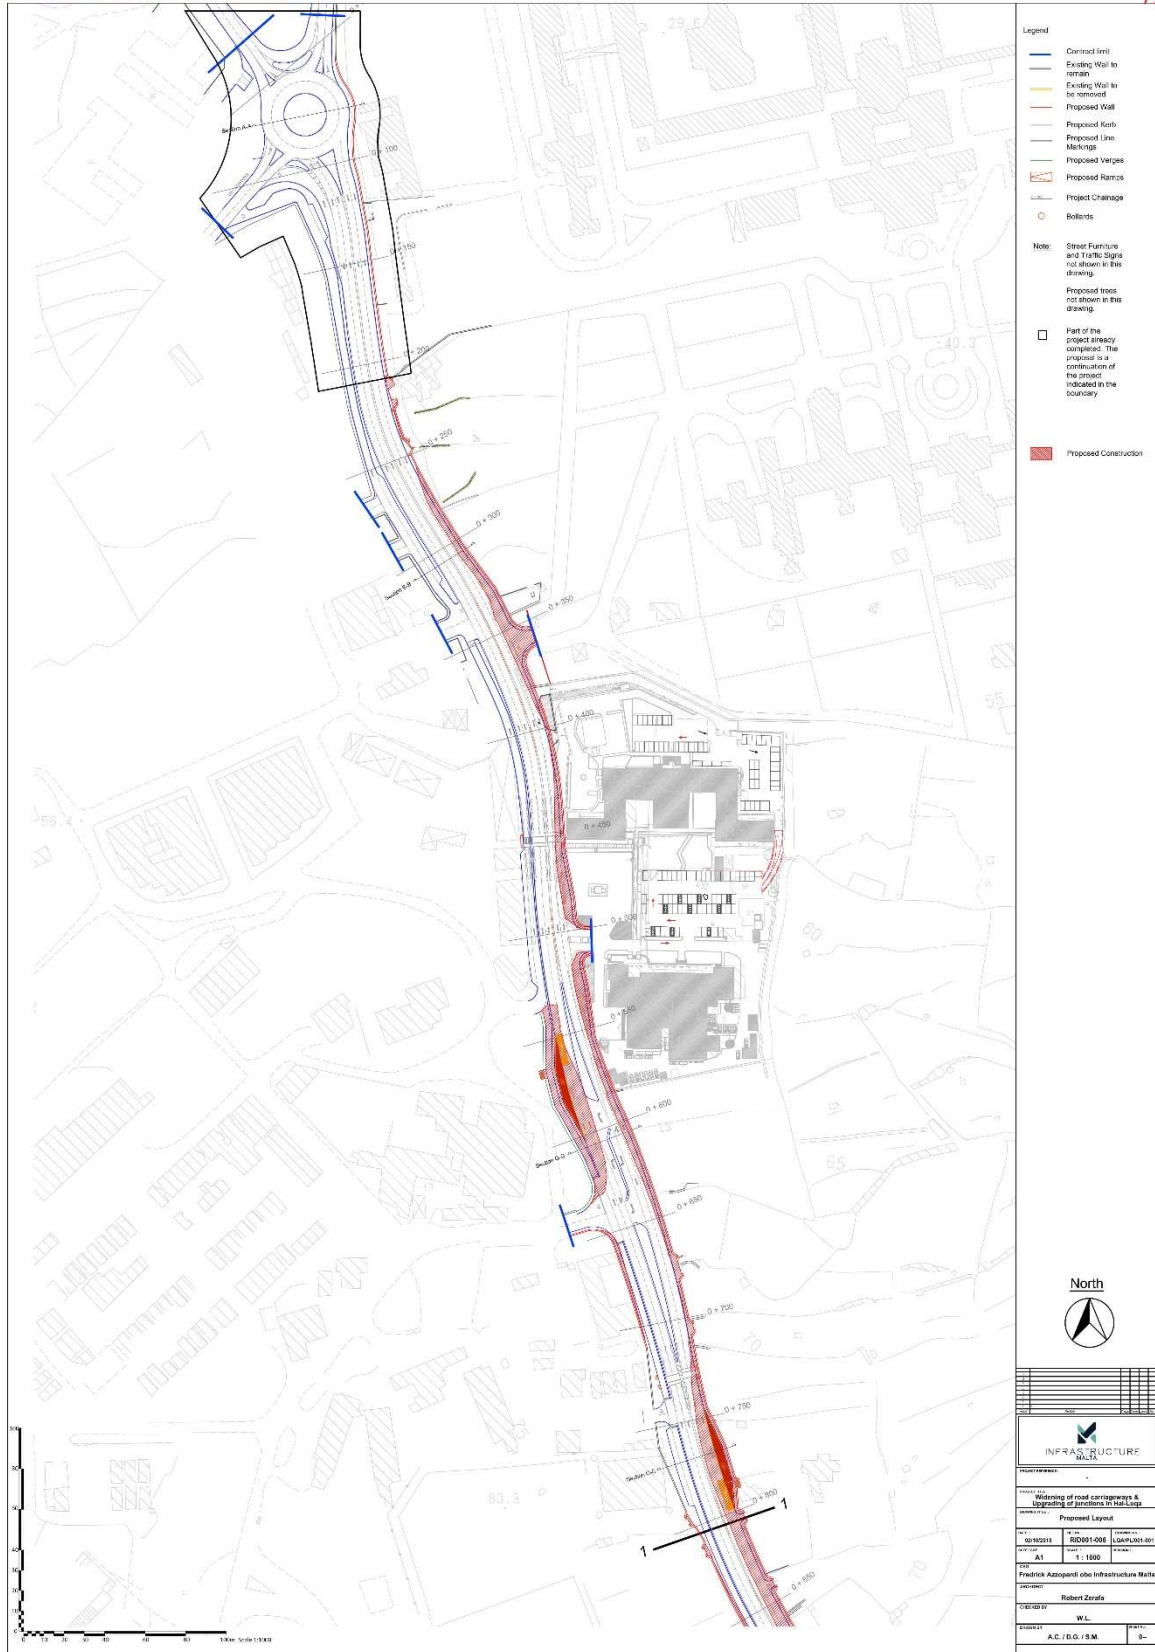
Block plan of the proposed road works/widening at Triq Ħal-Qormi (Source: PA/03427/18/Doc.77c)
